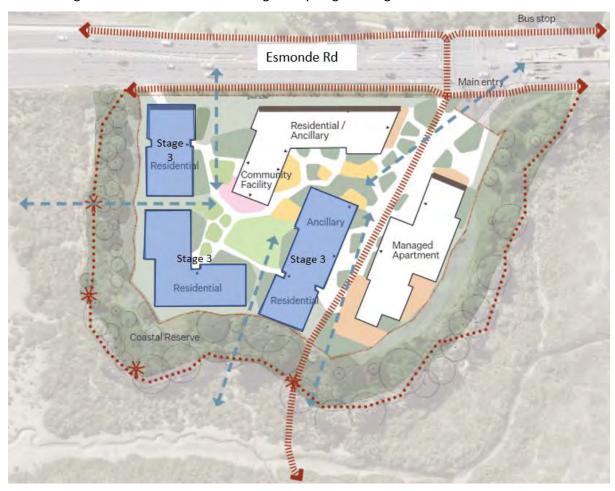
Proposed Masterplan for 48 Esmonde Road
